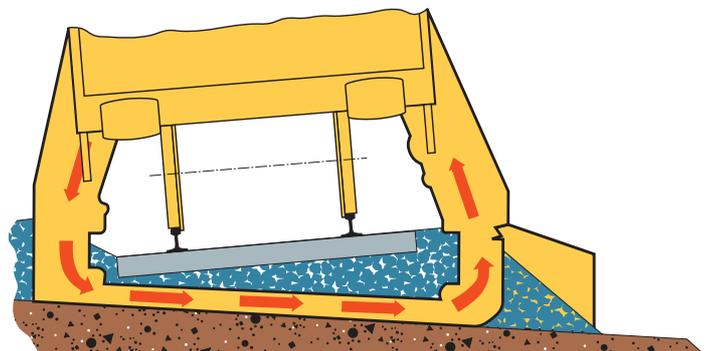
Positioning of cutter bar on Plasser & Theurer machines – to produce an accurate subgrade
